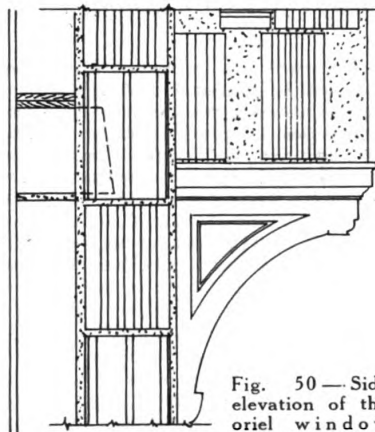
Side elevation of the oriel window shown in Fig. 48, illustrating the ornamental faces of the brackets and the floor slab, which are formed by pouring.
